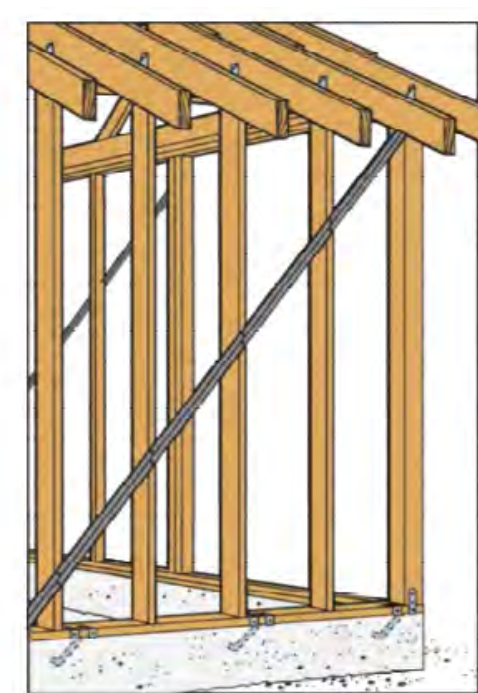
B—TYPICAL TWB (T-TYPE) EXTERIOR WALL BRACE INSTALLATION (MAXIMUM 1/2-INCH DEEP SAW KERF IN STUDS)
